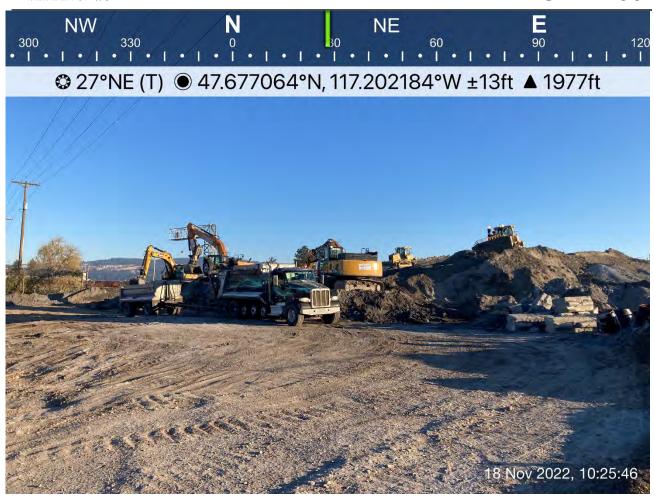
Trackhoes loading haul trucks with dross at the staging area and bulldozers
